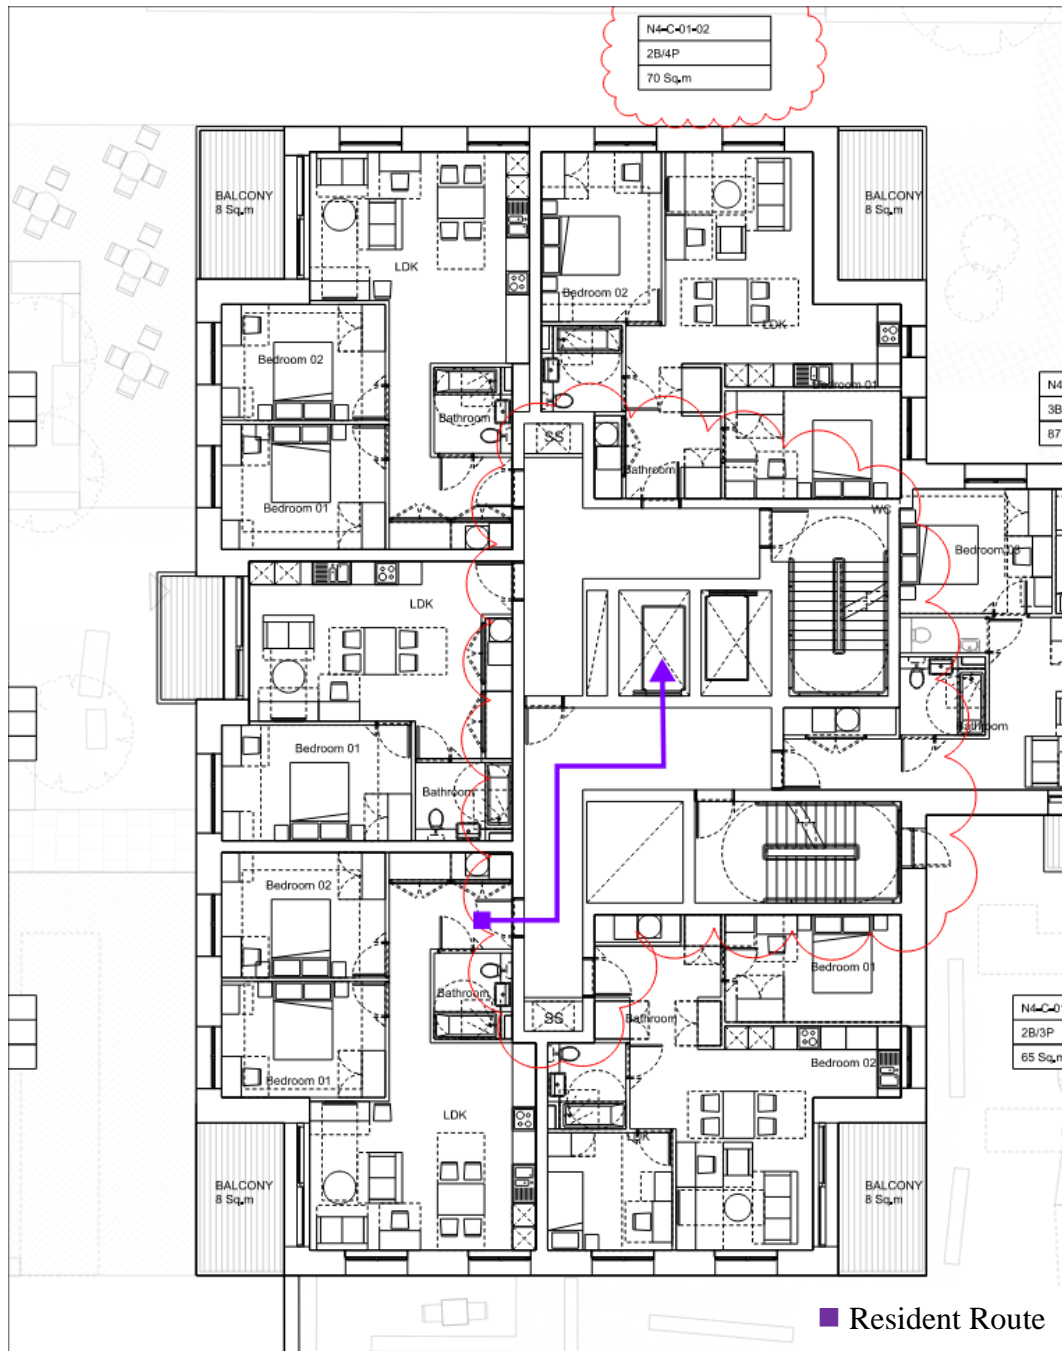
Longest residential waste conveyance route N4-C (typical upper floor)
